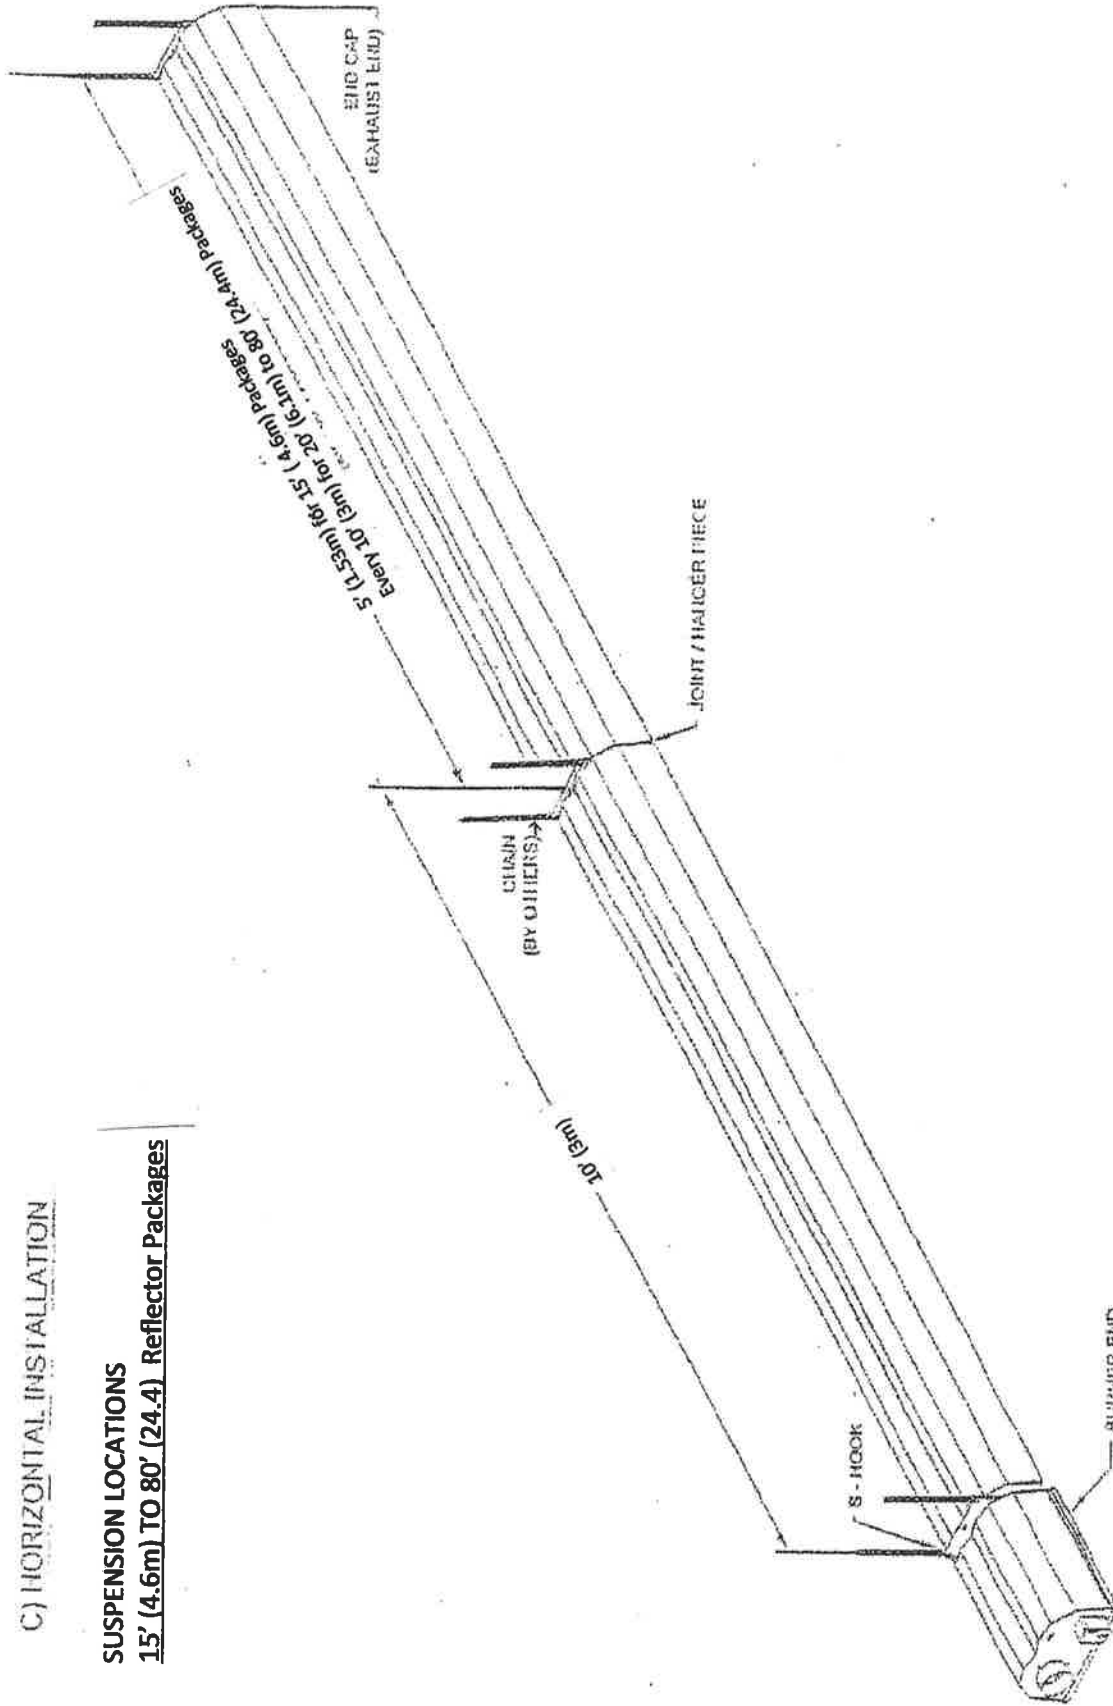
HORIZONTAL INSTALLATIONS - 15' (4.6m) TO 80' (24.4m) PACKAGES
